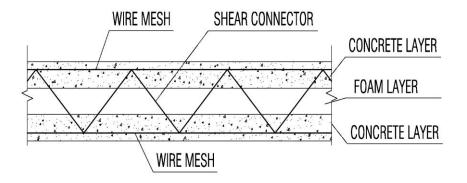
3D Sandwich Composite Panel-Cross Section
